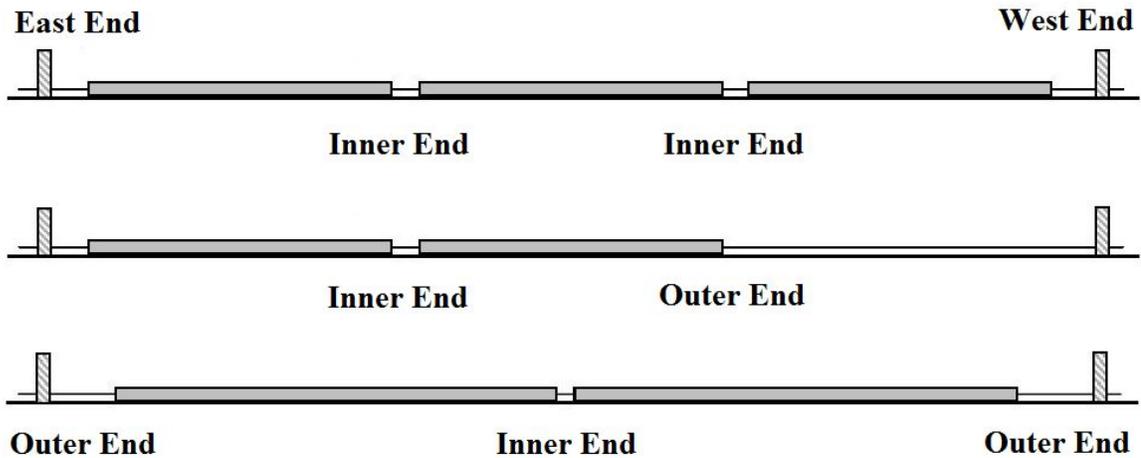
Prestressing bed configuration for production of (*top*) three BT-54 girders, (*middle*) two BT-54 girders, and (*bottom*) two BT-72 girders
